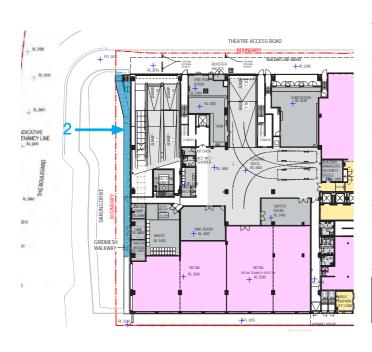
Section 96 NW Plot Proposed Detail of Flood Gate Precedent Images
